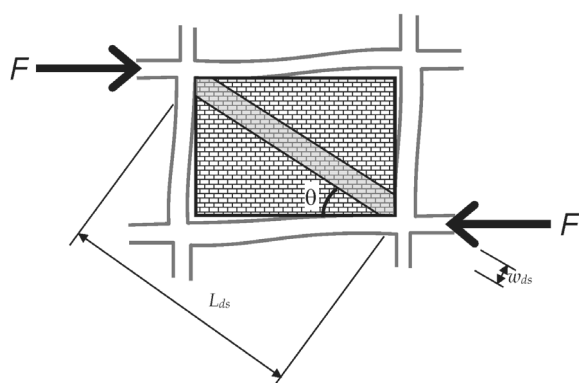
EQUIVALENT DIAGONAL STRUT OF URM INFILL WALL
